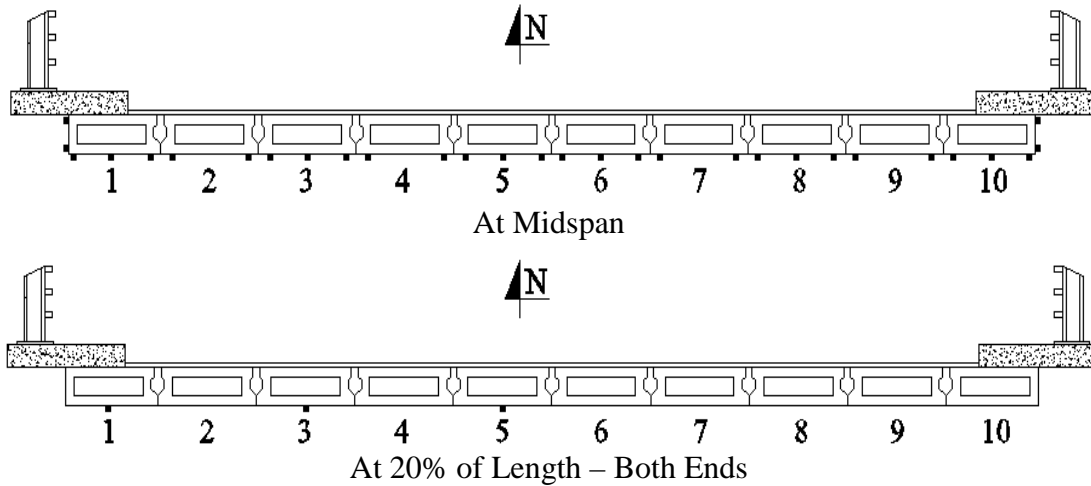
Cross section view of instrumentation layout for proof load testing (Bridge 8825).
